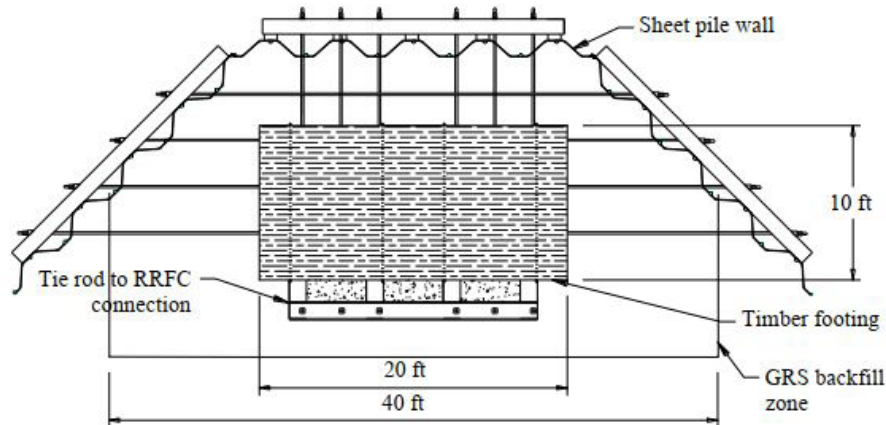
A plan view of the sheet pile abutment and backfill retaining system for demonstration projects in Tama County, Iowa (Evans et al., 2011).
